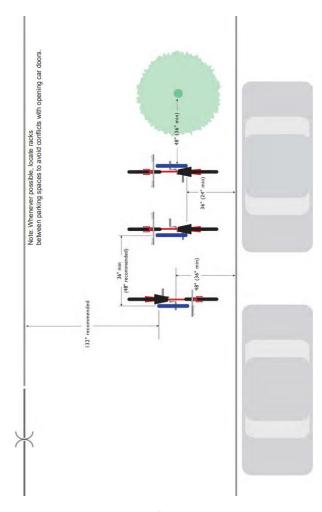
Typical Layout of Perpendicular Sidewalk Bike Parking Installations (Source: APBP²)
